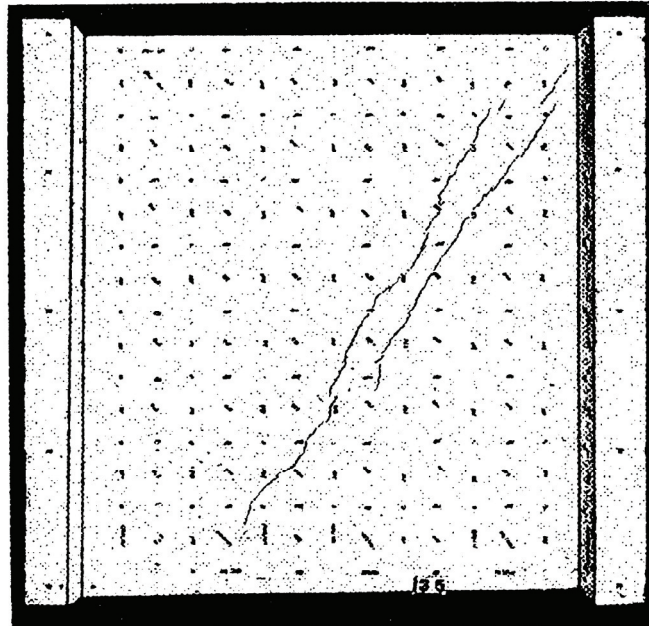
Initial shear cracks on wall S2 tested by Maier and Thürlimann (1985)
